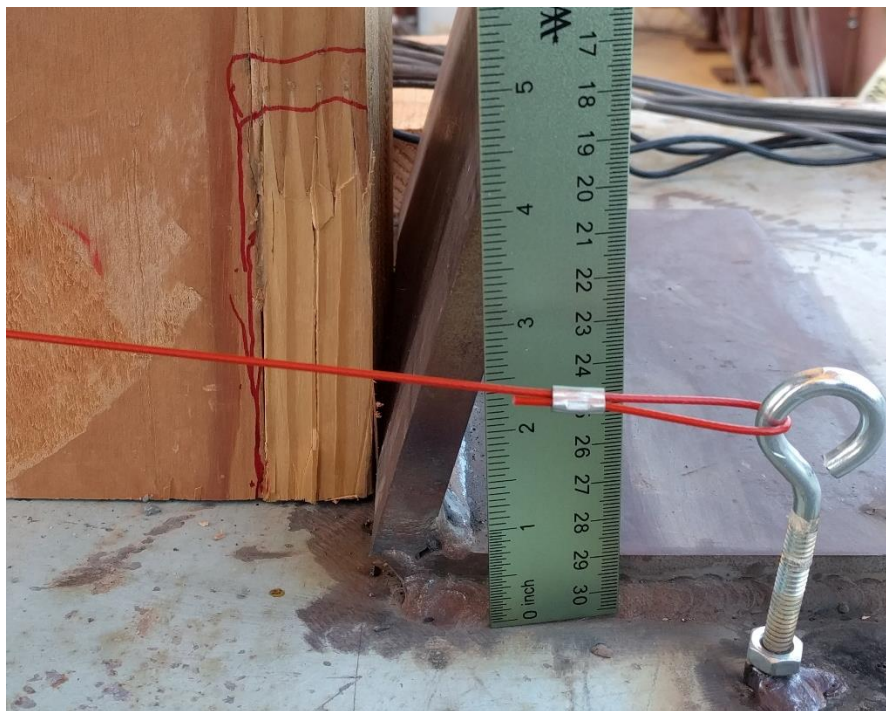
Toe crushing found at the foot of the rocking wall (north face of the NW panel)
